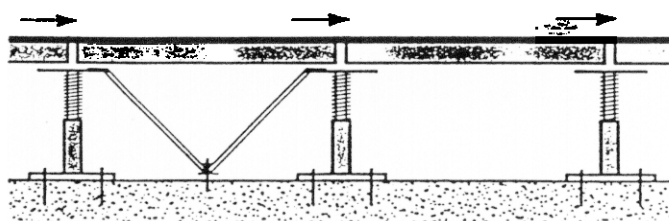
Raised Computer Floor Showing Lack of Lateral Bracing
